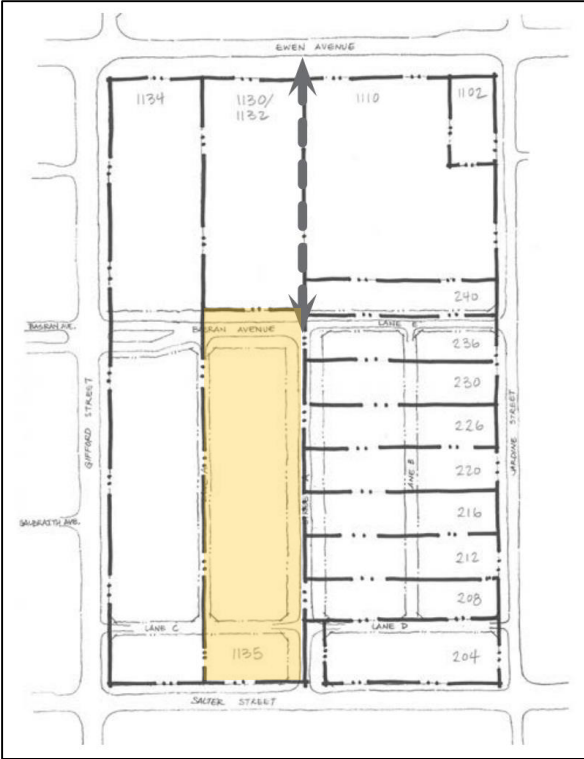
Advance Street Plan Area #2 (existing property lines shown in heavy black, while future property lines shown in light black – subject site is highlighted).
